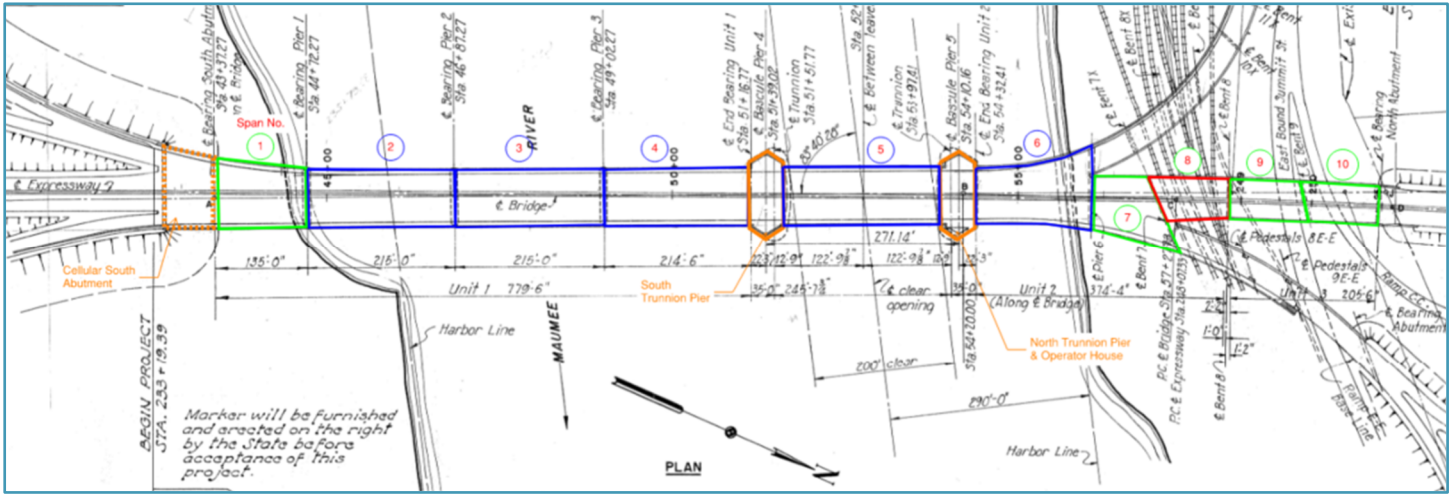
General Plan of Bridge, inspection plan color-coded for span type and access
